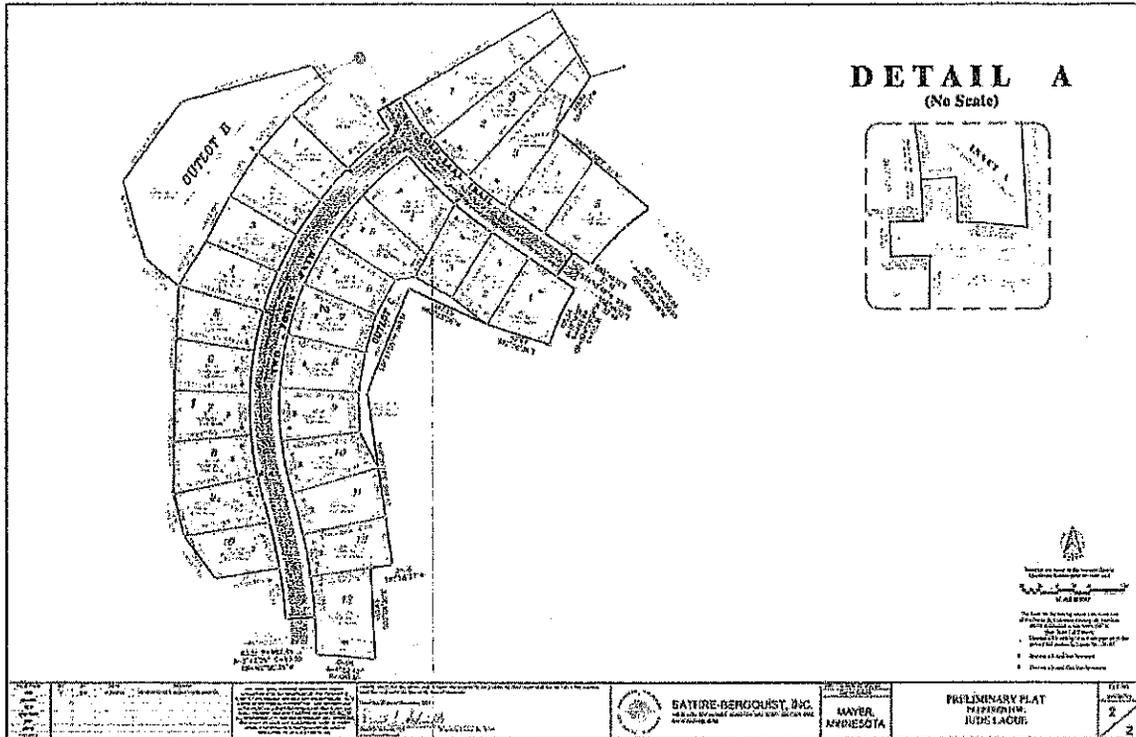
Exhibit C - Site Plan of Coldwater Crossing 7th Addition
